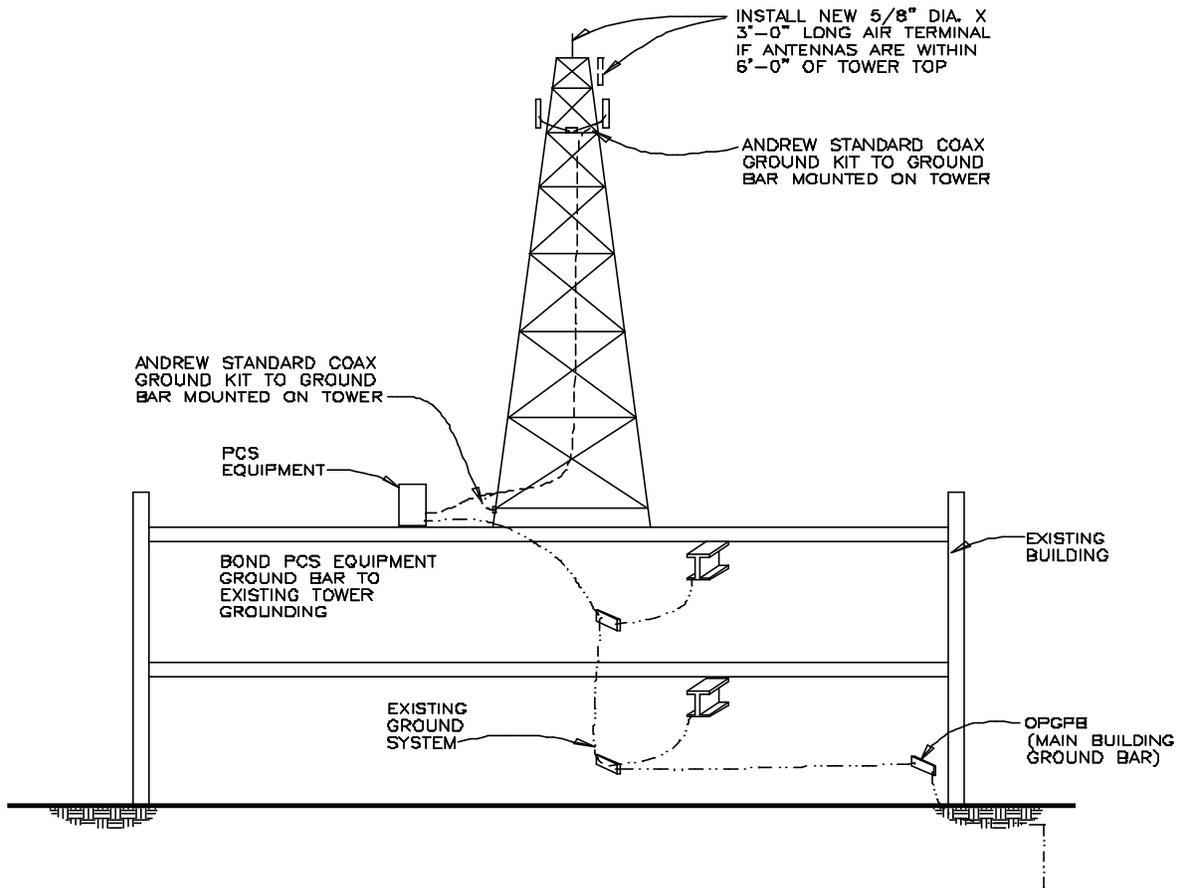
Grounding of PCS Equipment Mounted to an Existing Roof Tower
